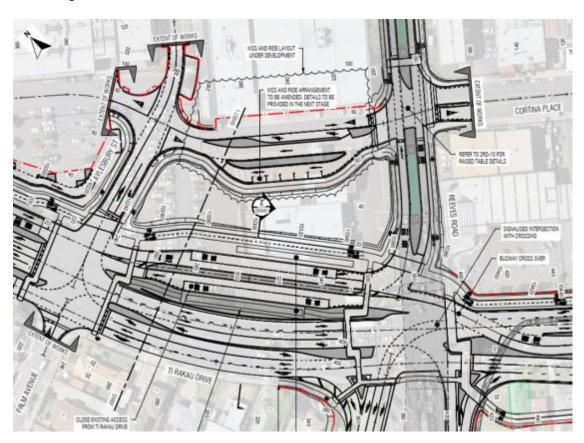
Proposed Pakuranga Town Centre major interchange station layout
